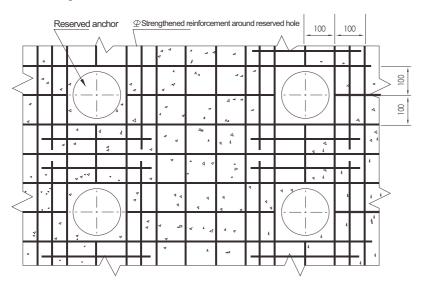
Plan Sketch of Steel Mesh Reinforcement
